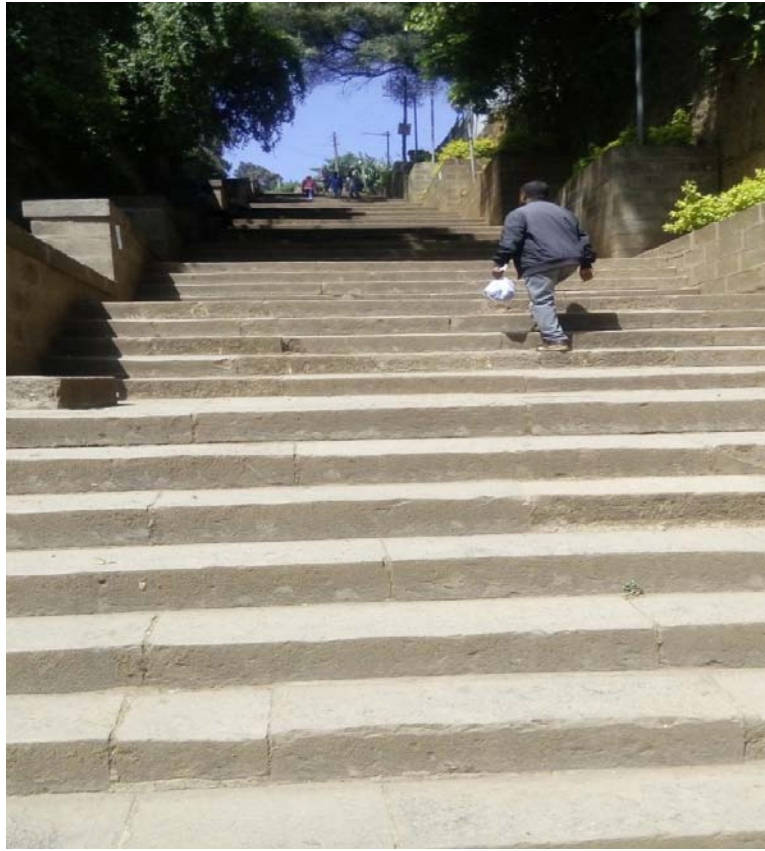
Example of up & down stair without ramp and handrail on the back side of Nazret Girls school from Ras mekonin bridge area to ENADB.
